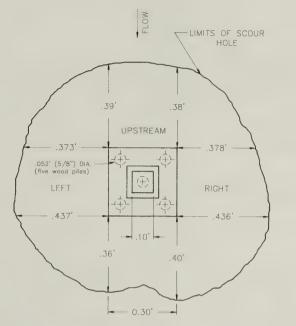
Plan view of scour hole, upstream footing, no debris.
